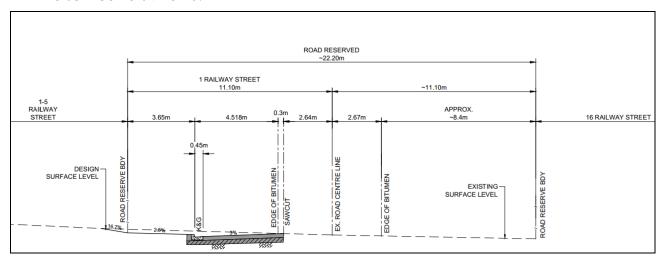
Railway Street formation fronting Lots 7 & 10
